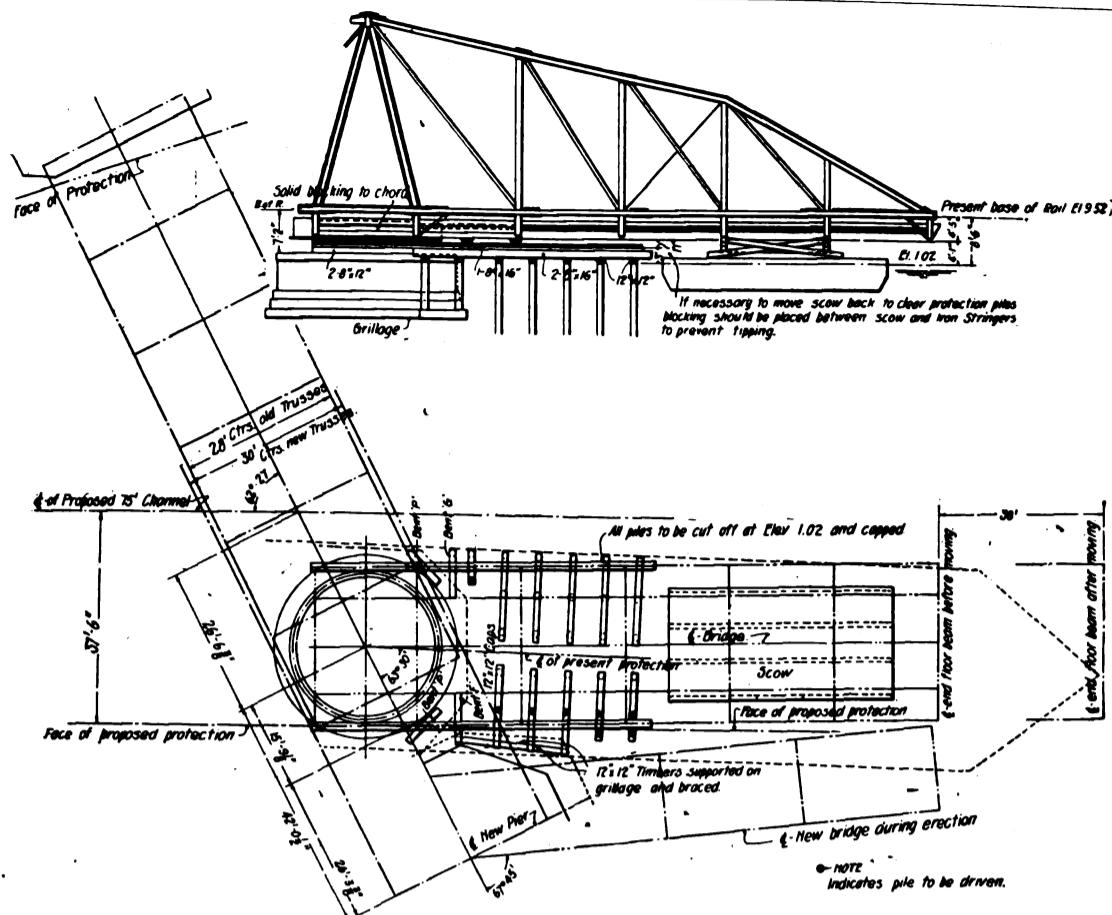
PLAN FOR REMOVING NORTH END OF OLD BRIDGE.
